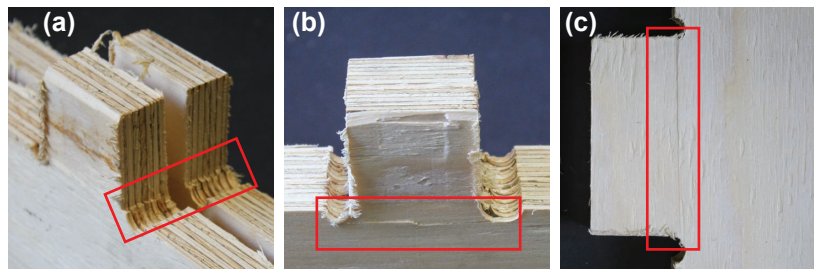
Failure pictures of T2 specimens: (a) Axonometry / (b) Front view T2-50 / (c) Front view T2-100.
